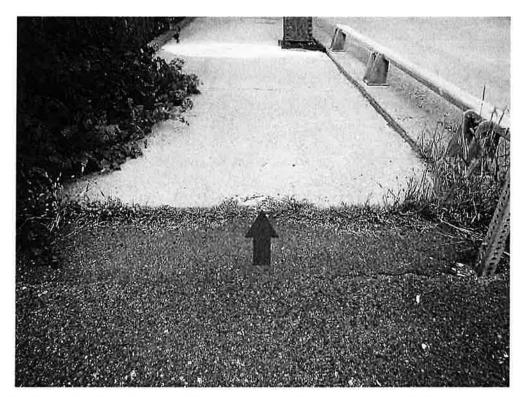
South sidewalk at the east end (at the interface with the southeast approach sidewalk), looking west - edge spall.
